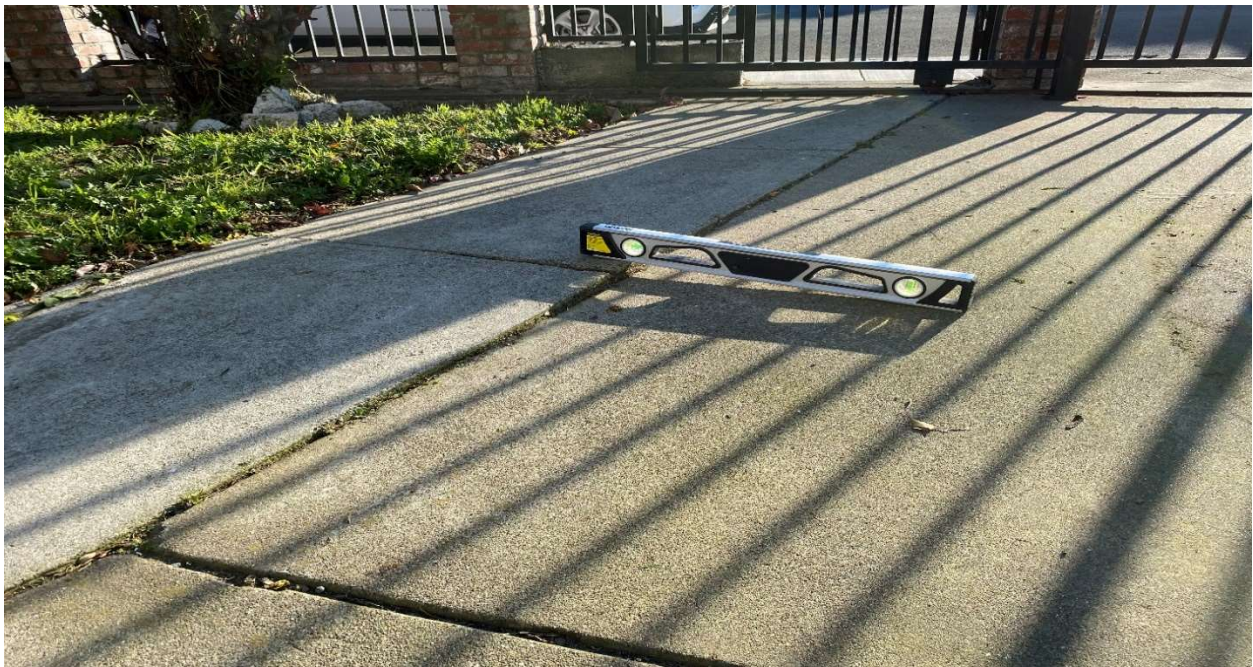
View along transitional walkway and circa 1980s driveway slab (with vertical offset).
